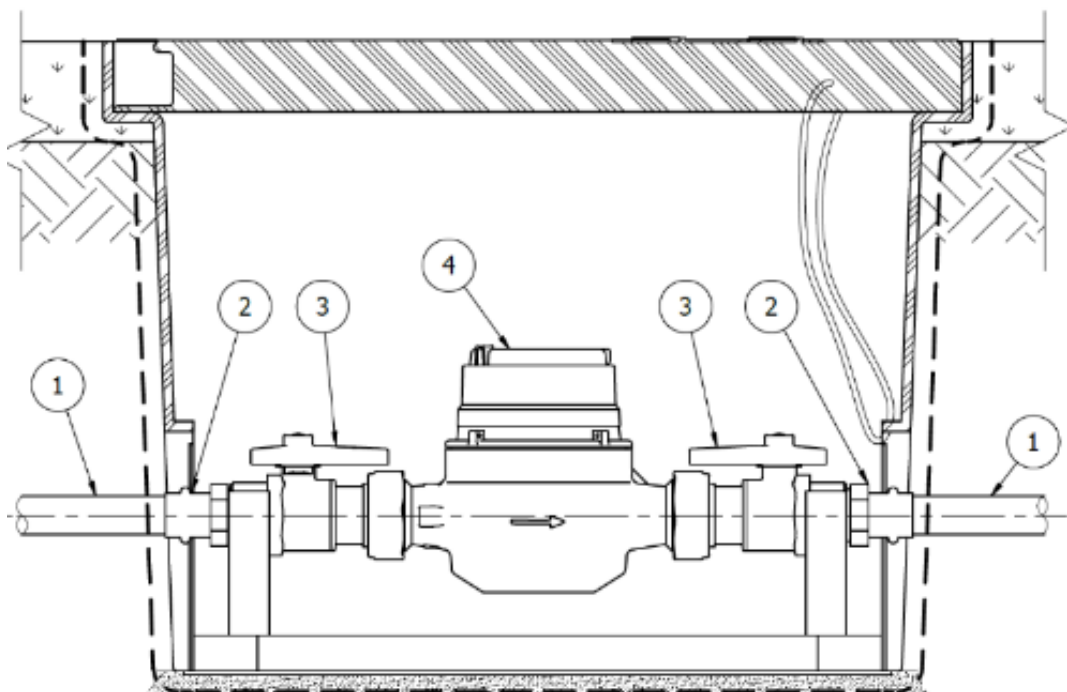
Approved Water Sub-Meter DN20 – Inground pit installation
